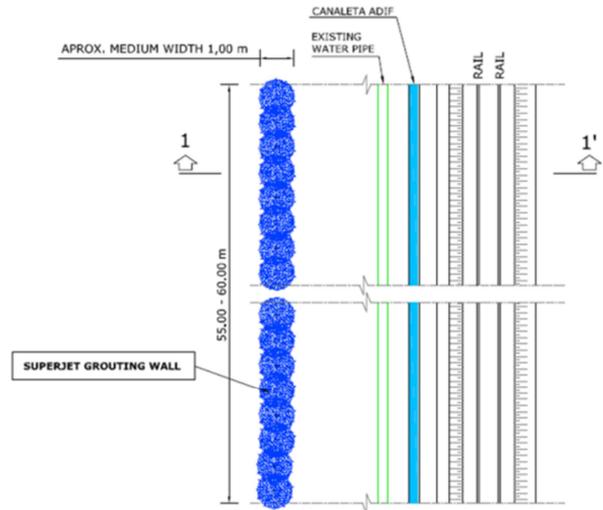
Plan view – Soilcrete® as a vertical wave barrier
